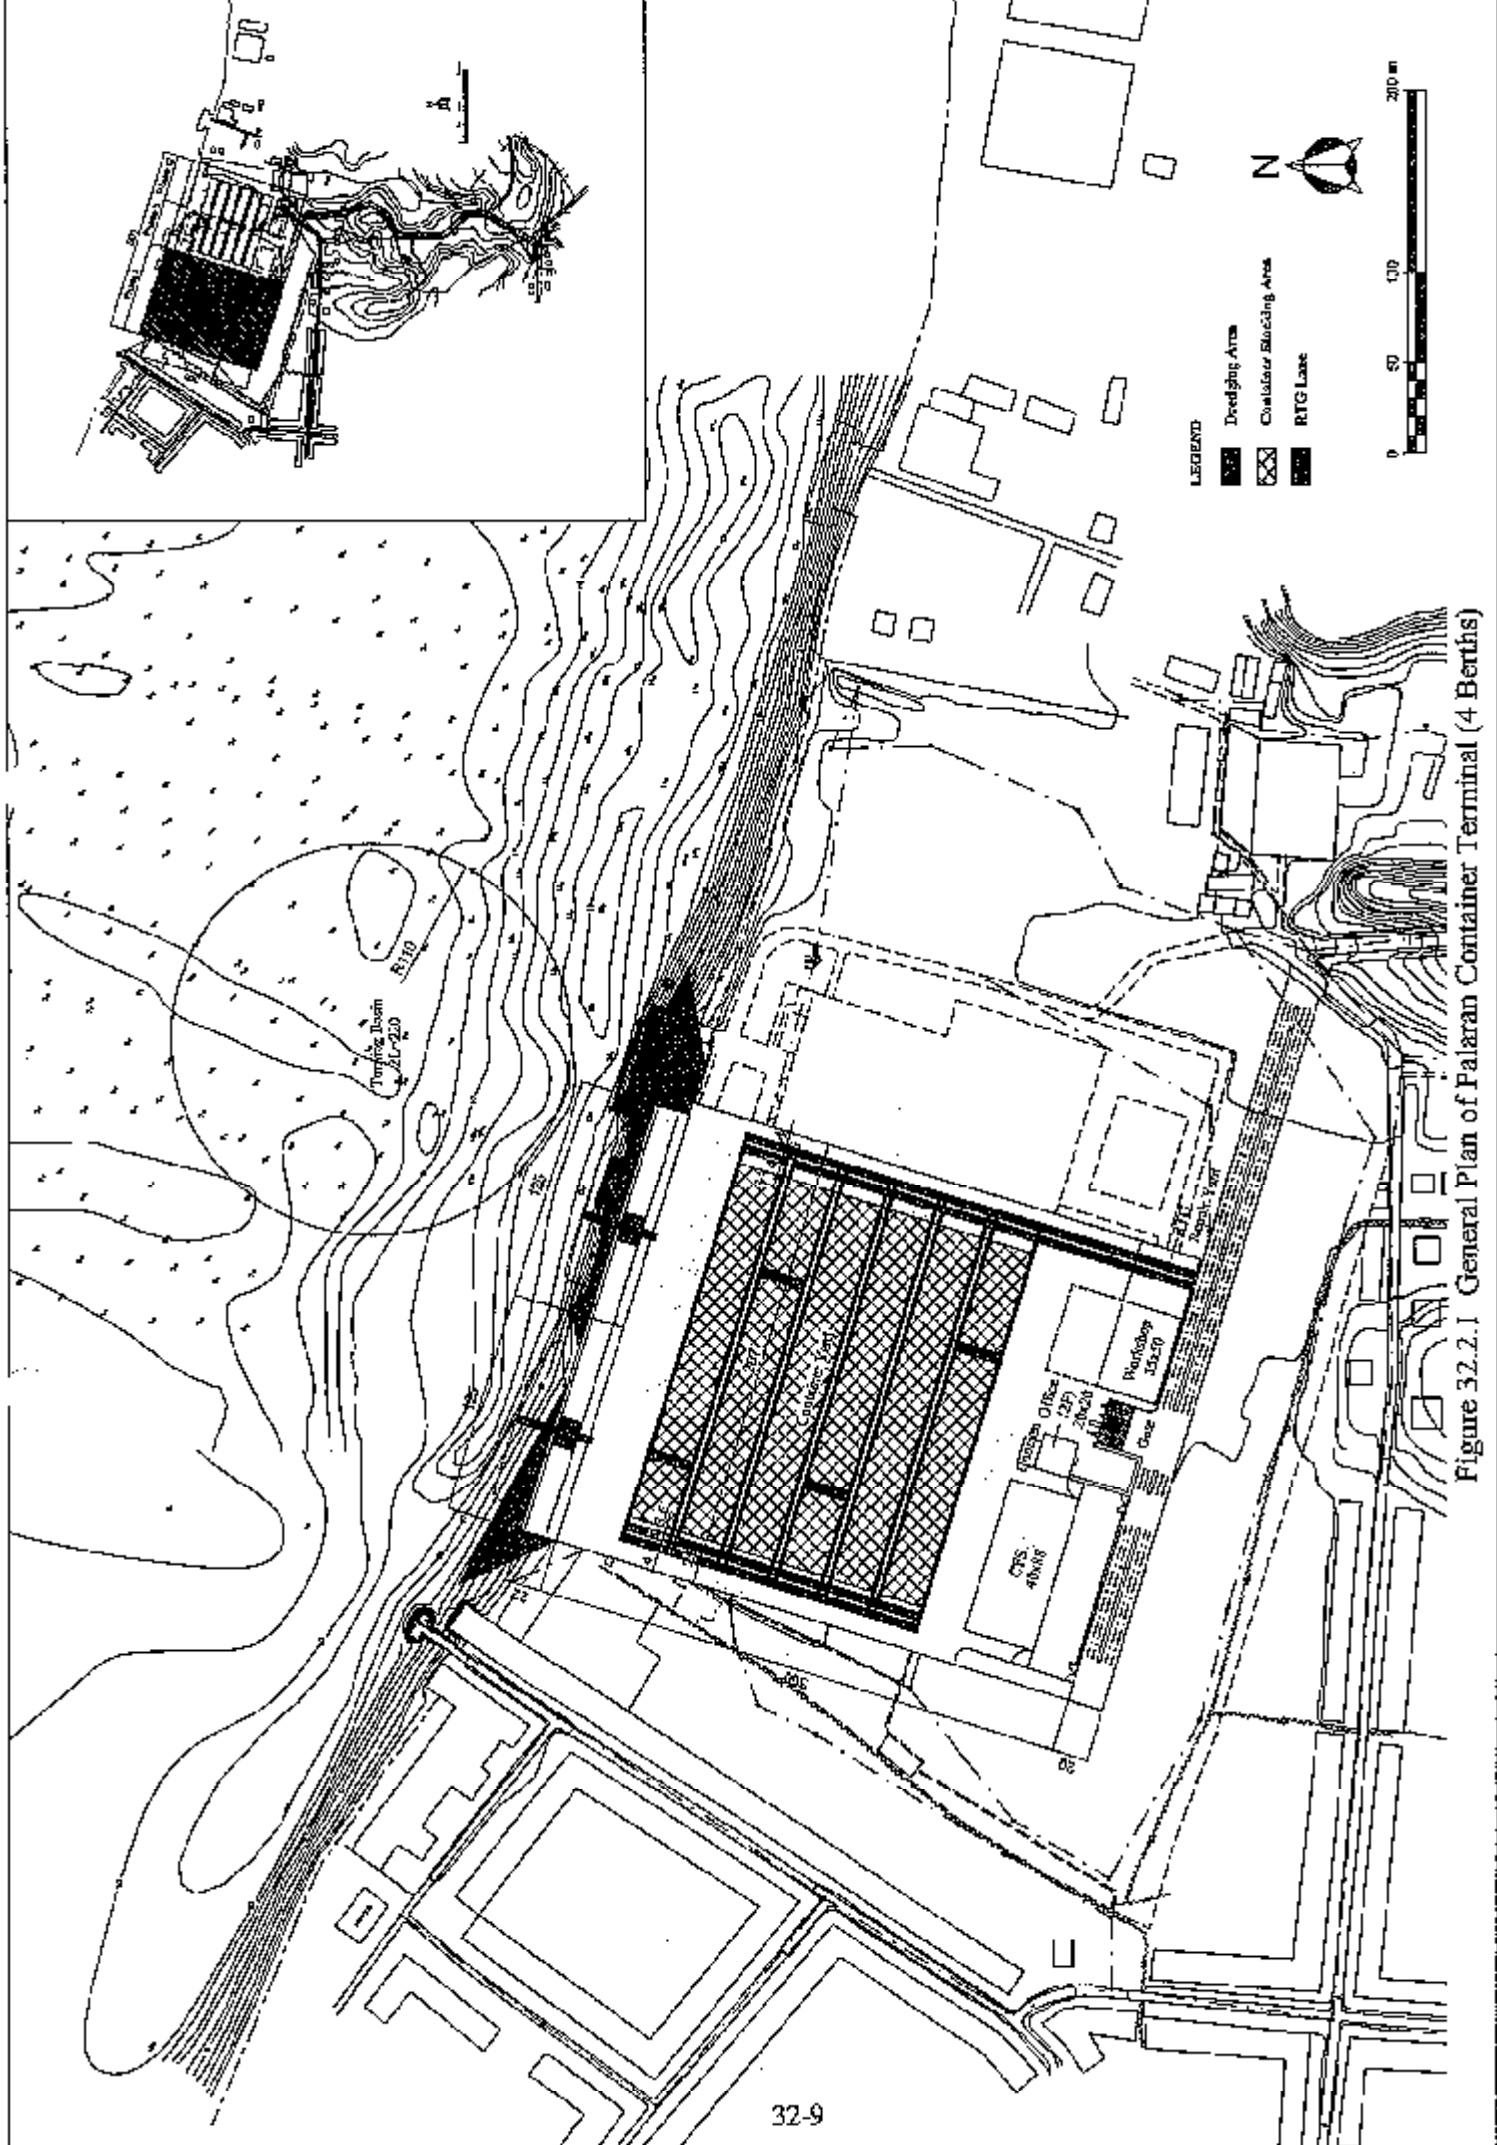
General Plan of Palaran Container Terminal (4 Berths)
